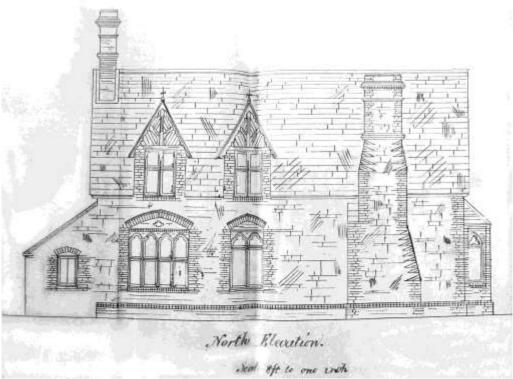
Chick's drawing of the north elevation of Lyde vicarage
